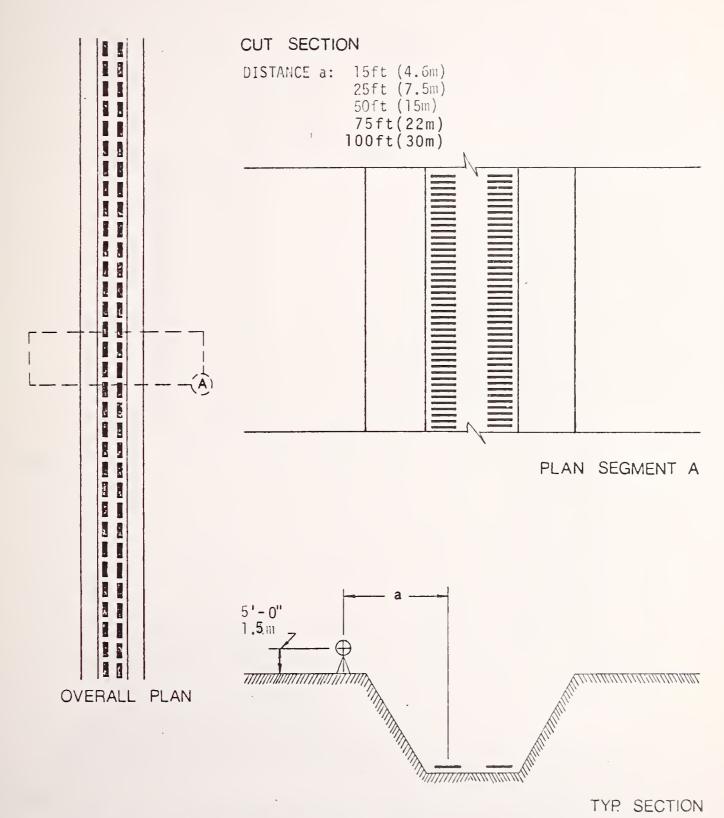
Wayside Measurement Location Adjacent to Cut Sections
